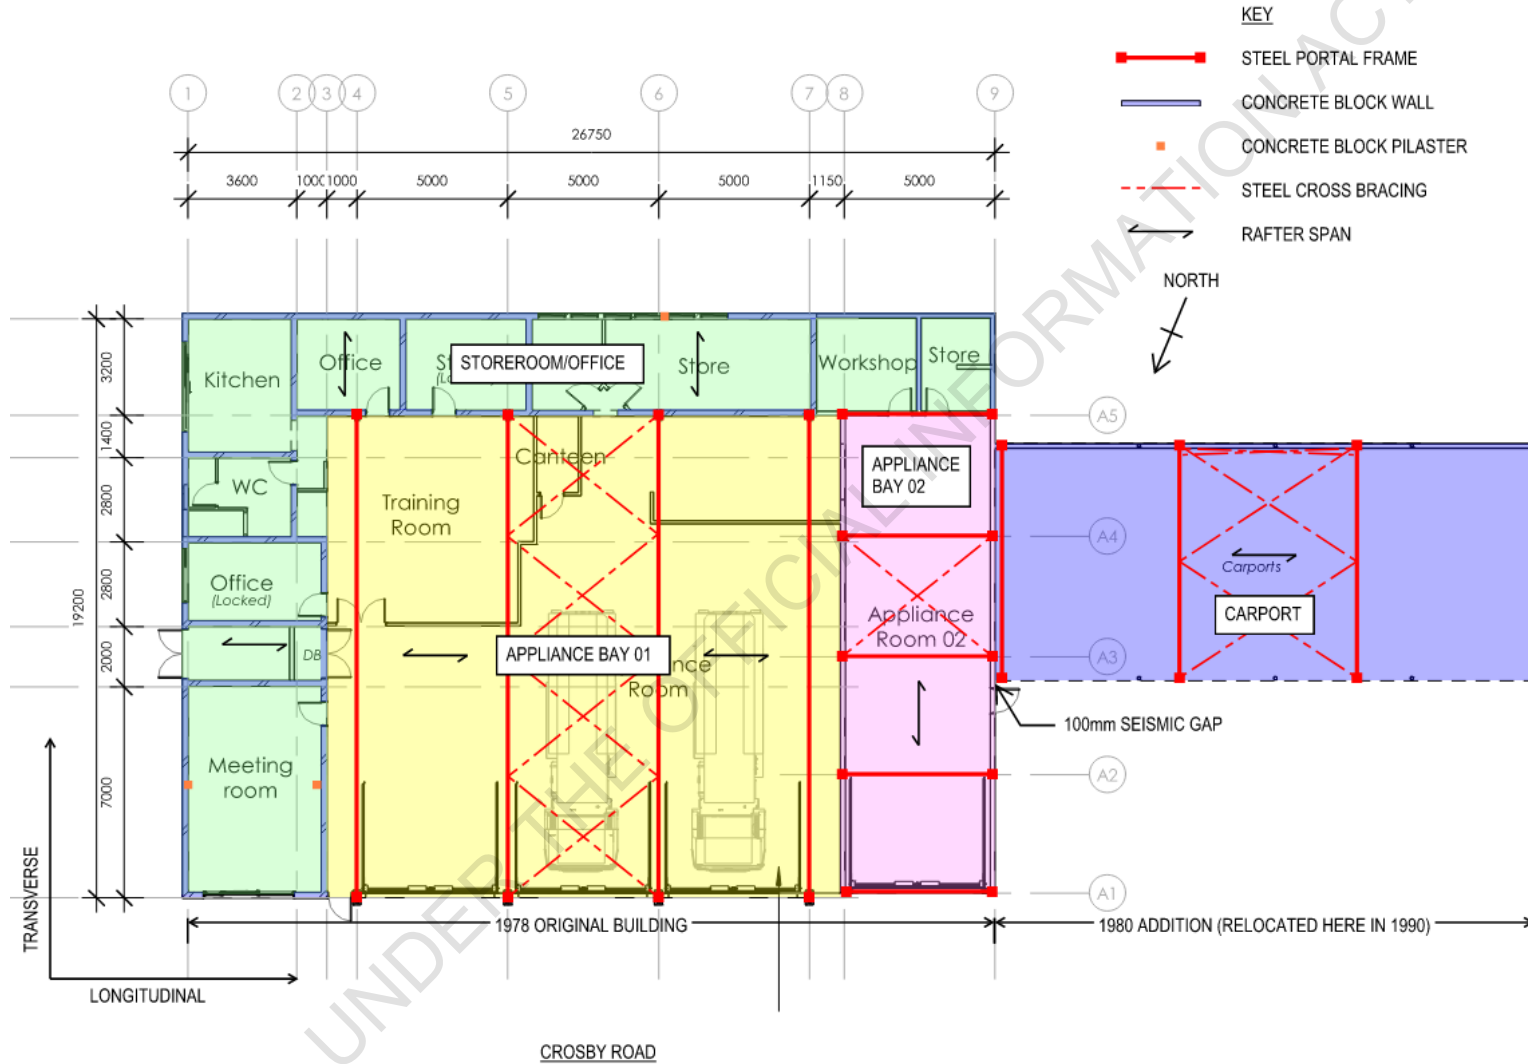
Floor Plan of the Operational Support Building at Chartwell Fire Station and loading directions
